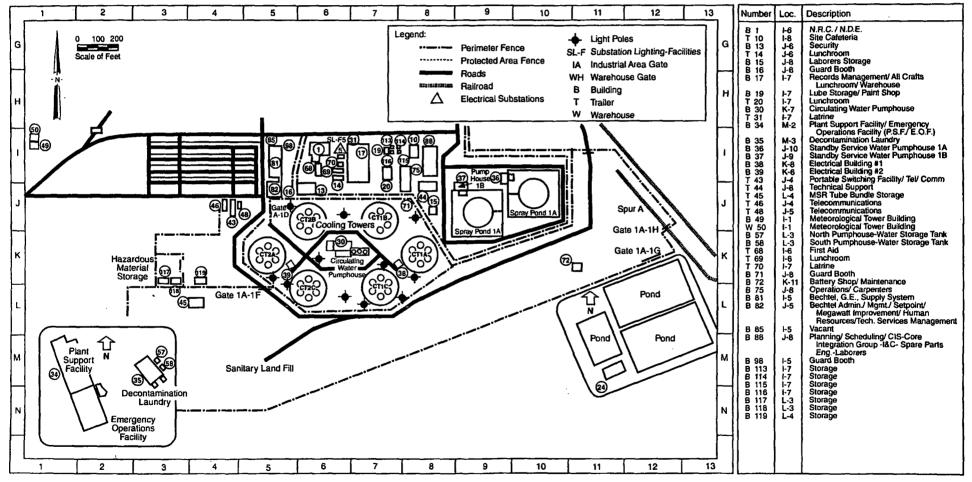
Site layout of the reference BWR plant facilities, Sheet 4
